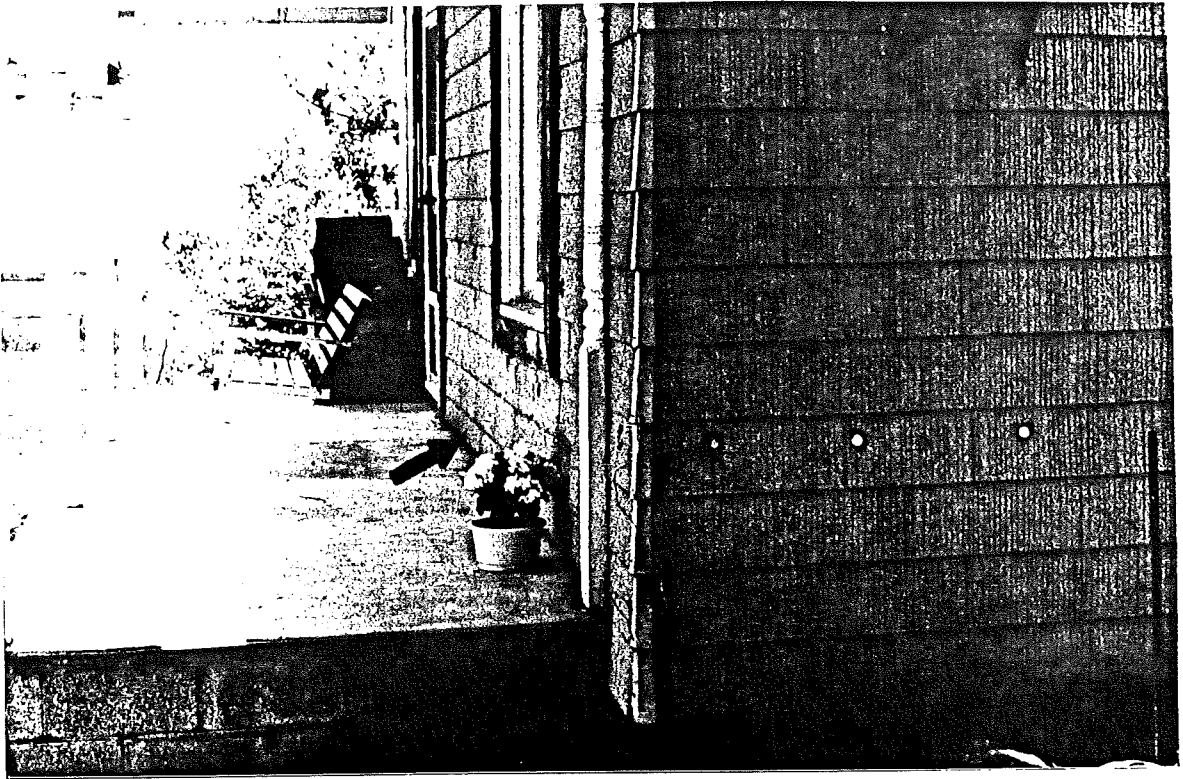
Porch pulling away from house approximately 1-1/2 inches due to settlement of its foundation.
